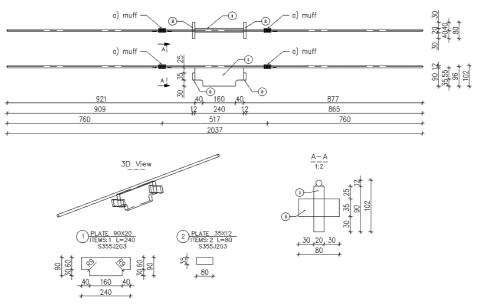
The geometry of the balcony connection in Stage II (with muff – element a)) – set II\_ZB\_1\_4 (the geometry of balcony connection has been modified in relation to Stage I)
